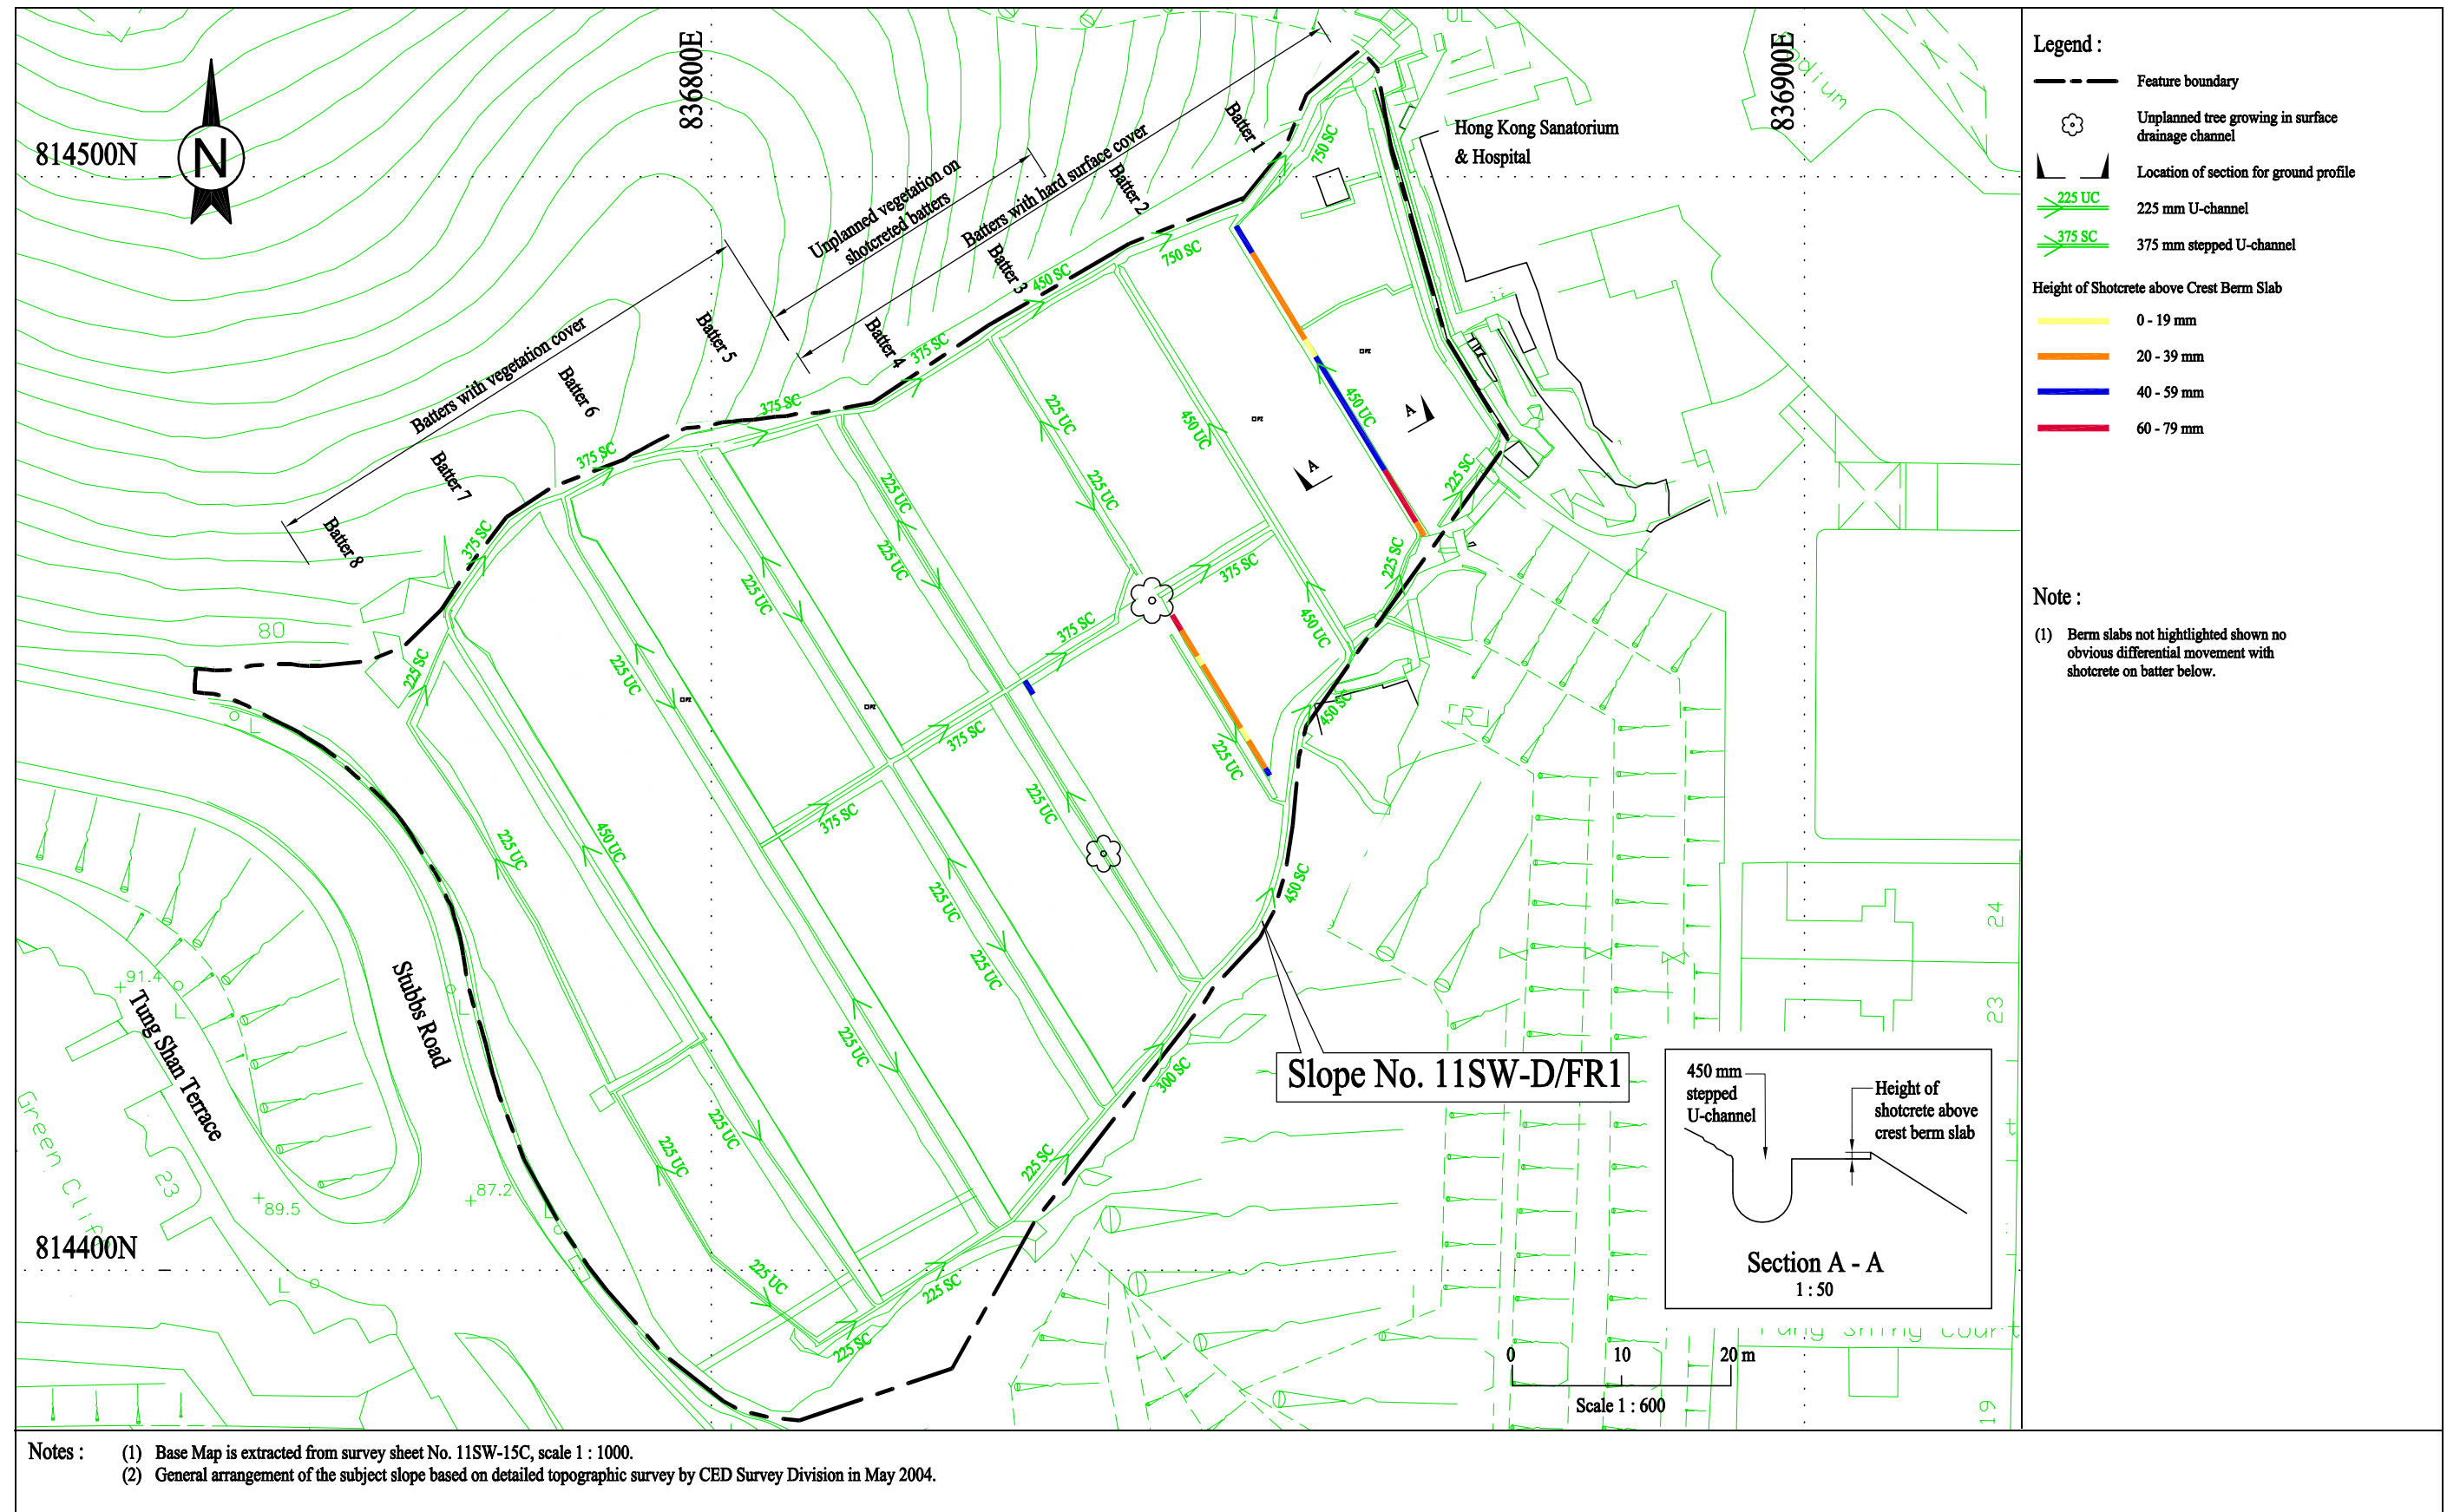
Distress Mapping of Slope No. 11SW-D/FR1 - Height of Shotcrete above Crest Berm Slab
